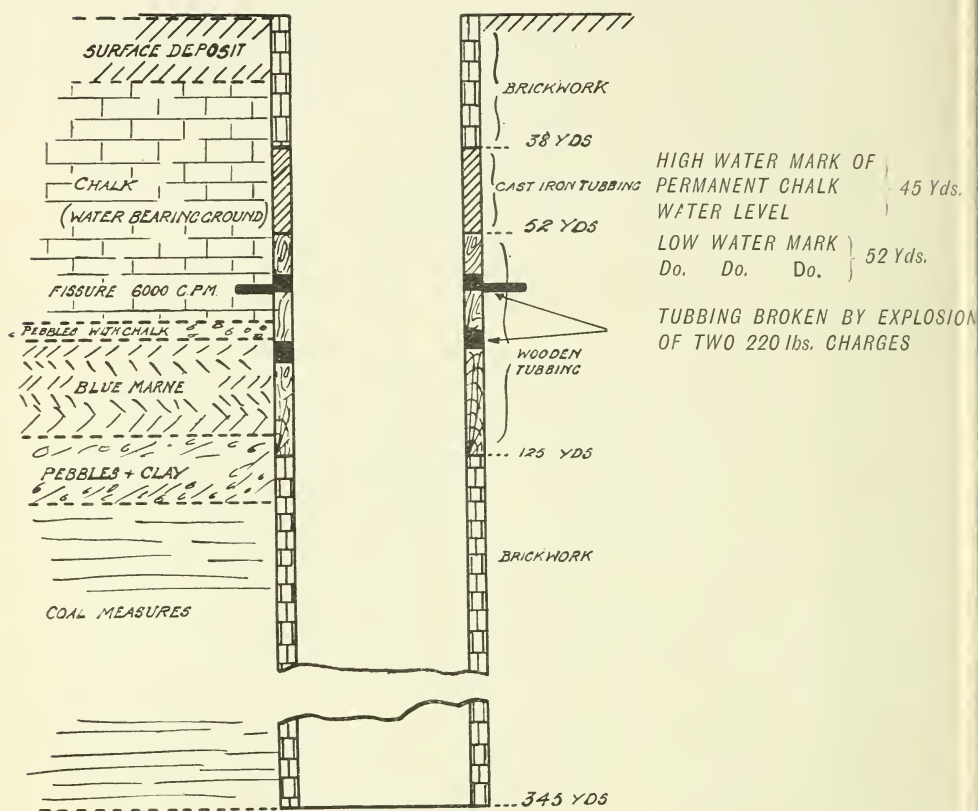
SECTION OF A SHAFT, SHOWING TUBBING DESTROYED BY EXPLOSION.
